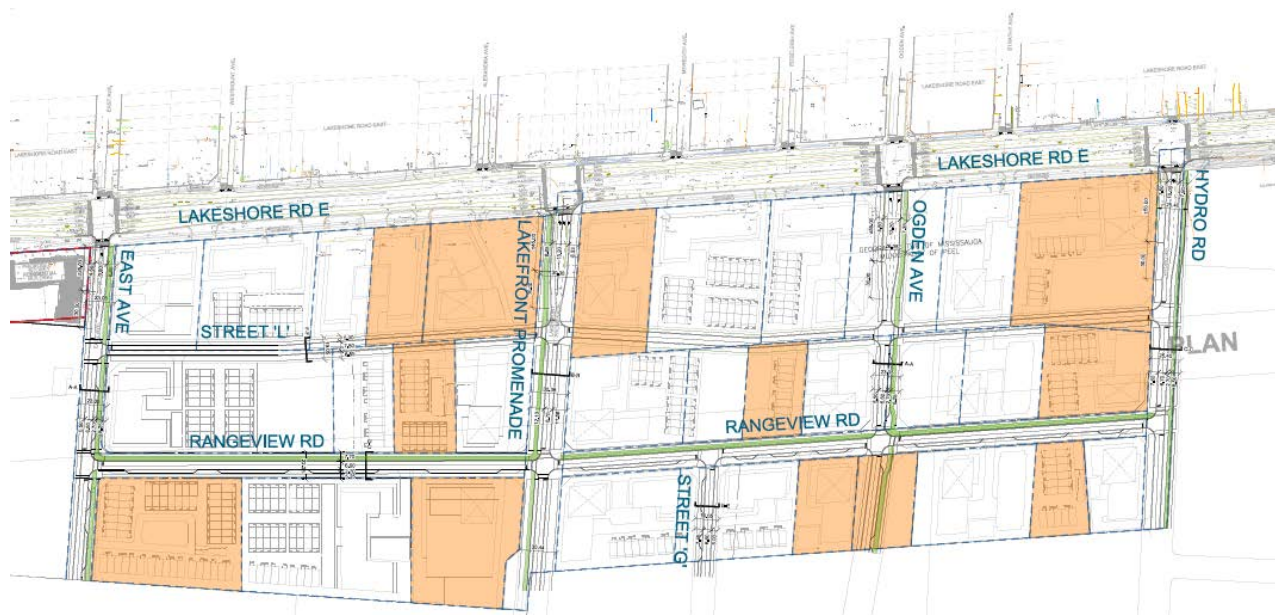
PLANNED RANGEVIEW ROAD NETWORK CONNECTING TO LAKEVIEW VILLAGE ROAD NETWORK
